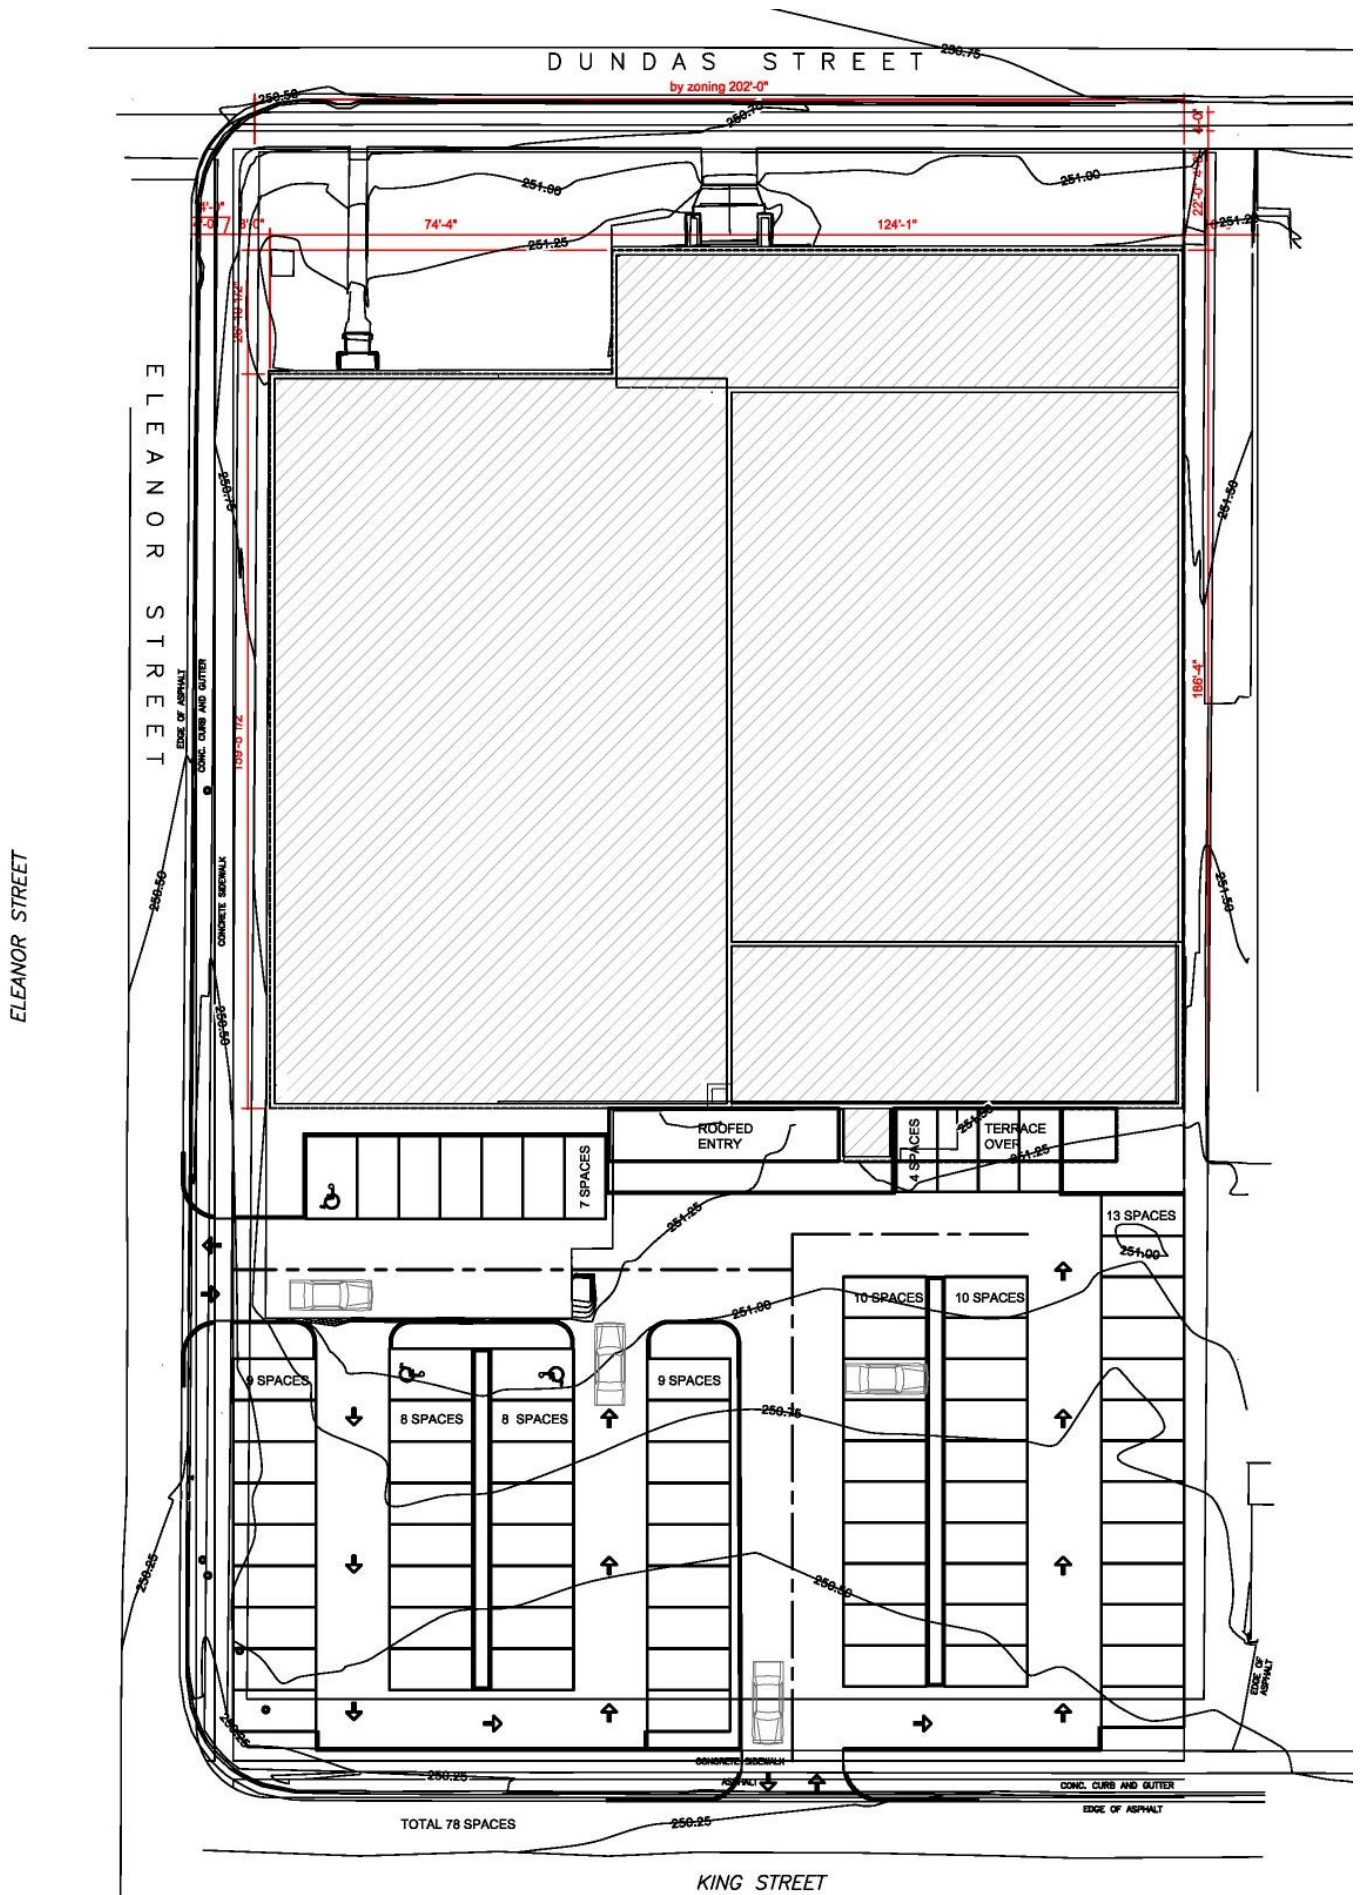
1153-1155 Dundas Street – Initial Conceptual Site Plan
